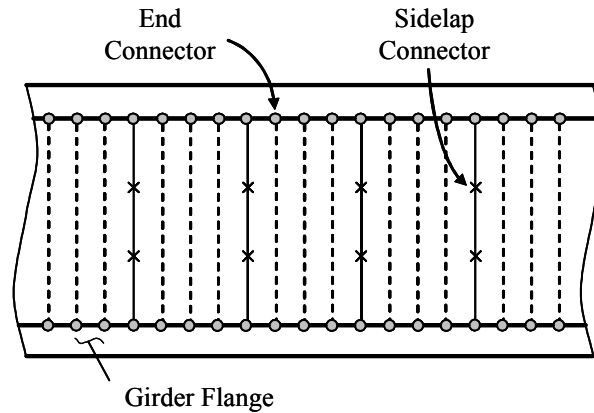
SCHEMATIC LAYOUT OF A BRIDGE DECK FORM
